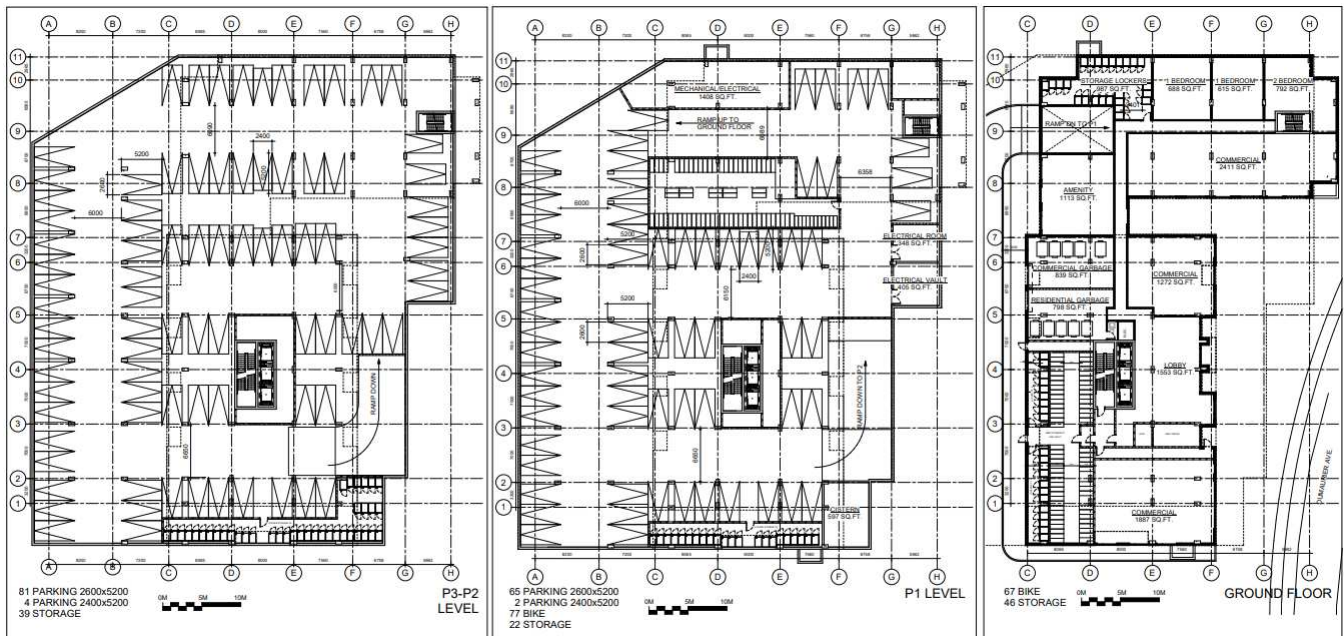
Parking Garage (Left and Centre) and Ground Floor (Right) Plans of the Proposed Development
